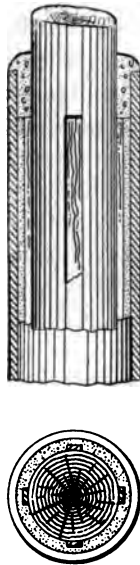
Armoring for Timber Piles, Cockle Creek Bridge, New South Wales.
